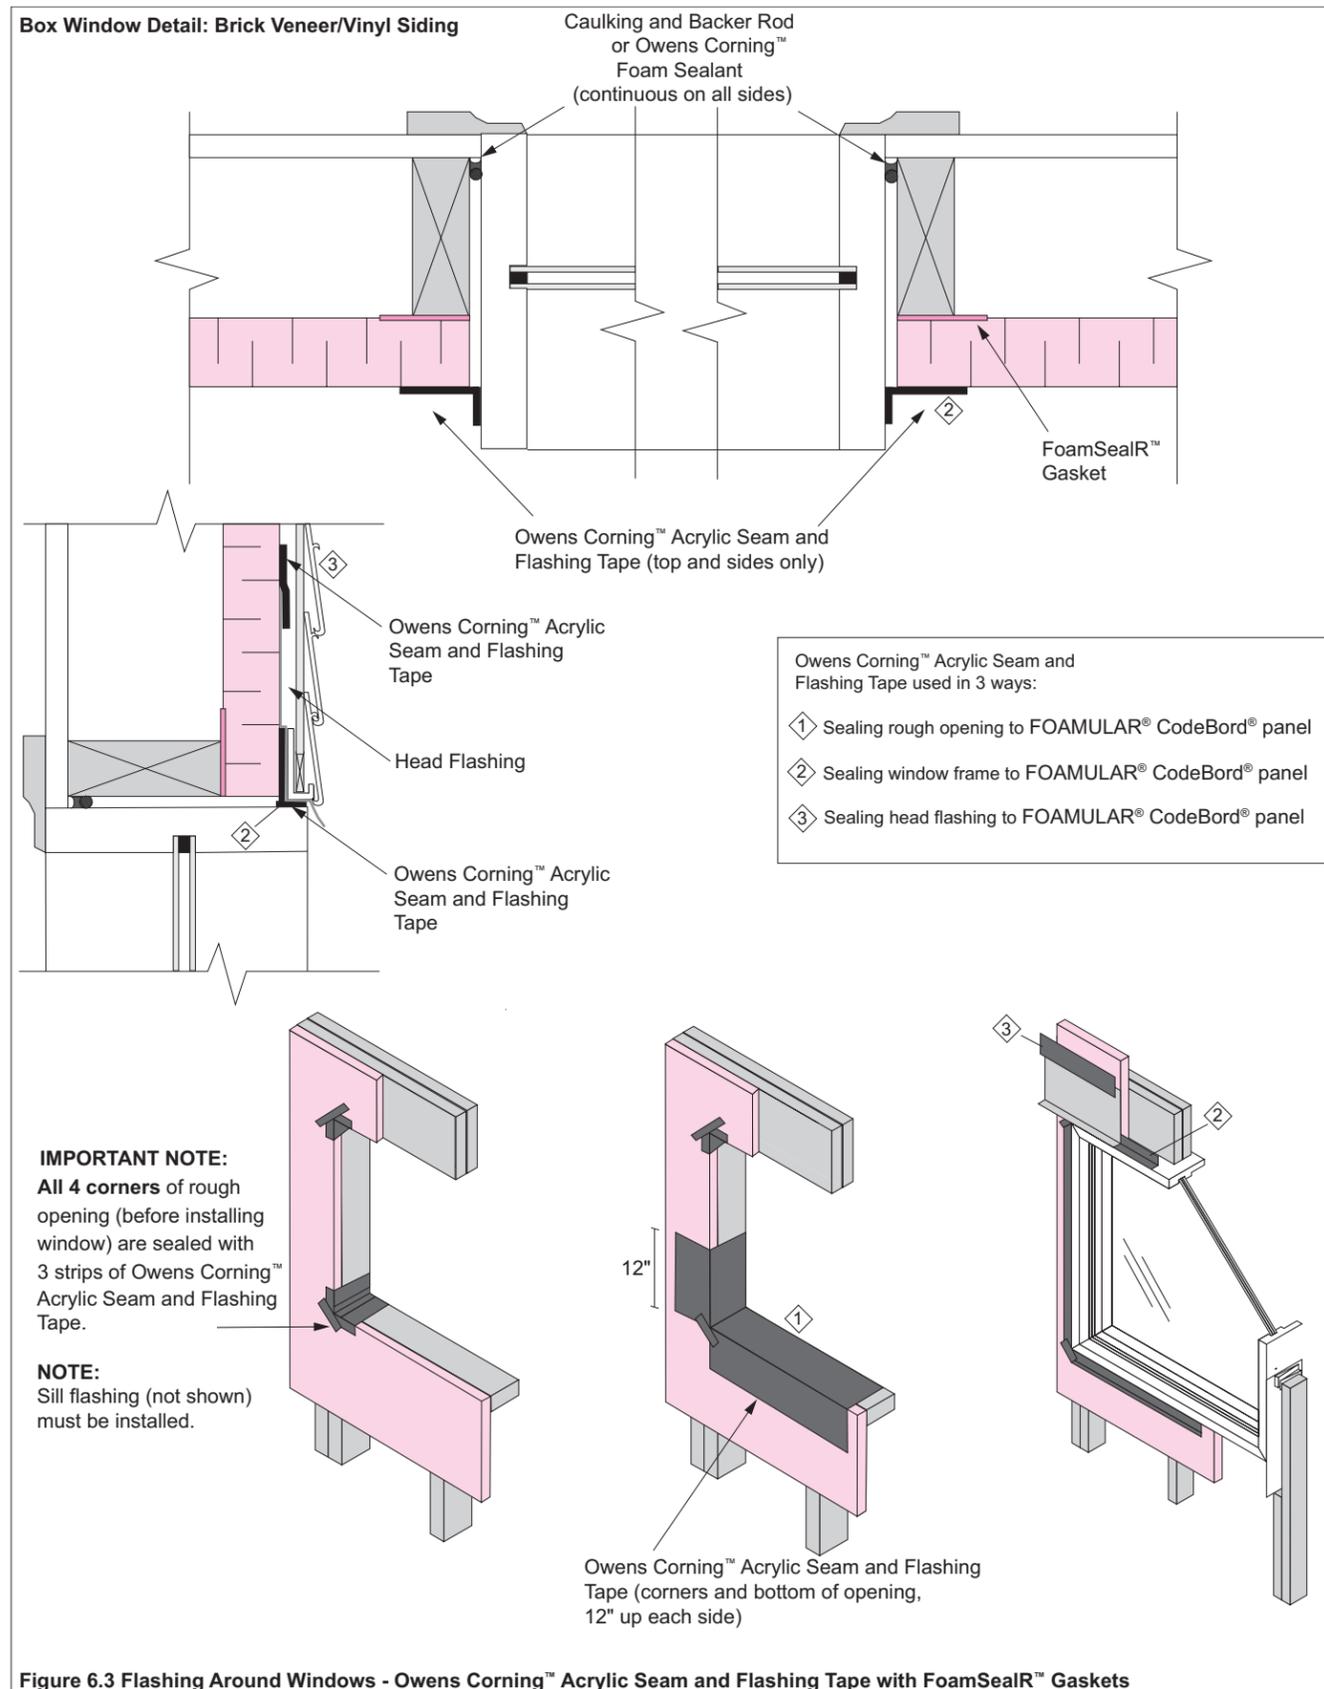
Flashing Around Windows - Owens Corning™ Acrylic Seam and Flashing Tape with FoamSealR™ Gaskets
